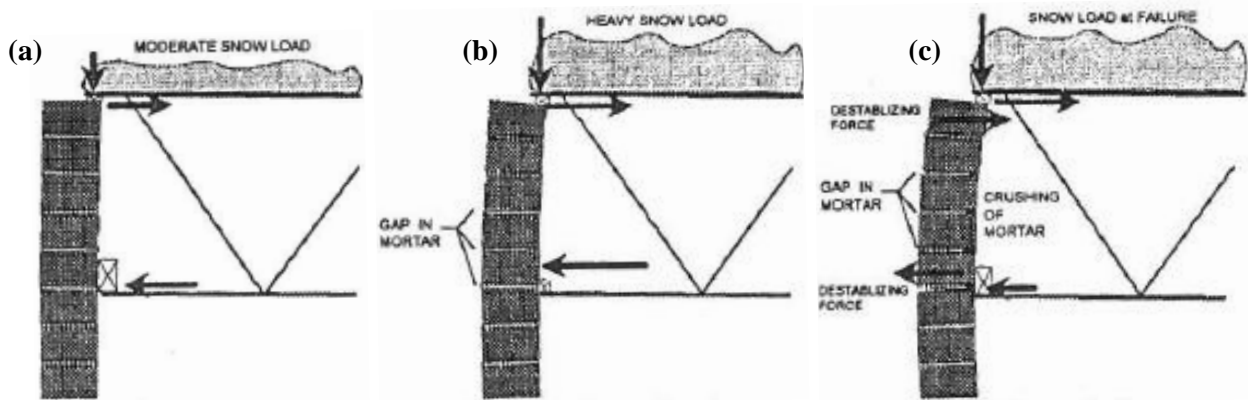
Masonry wall behavior under (a) moderate snow load, (b) heavy snow load, and (c) just prior to failure (J.R. Harris & Co. 2011).
